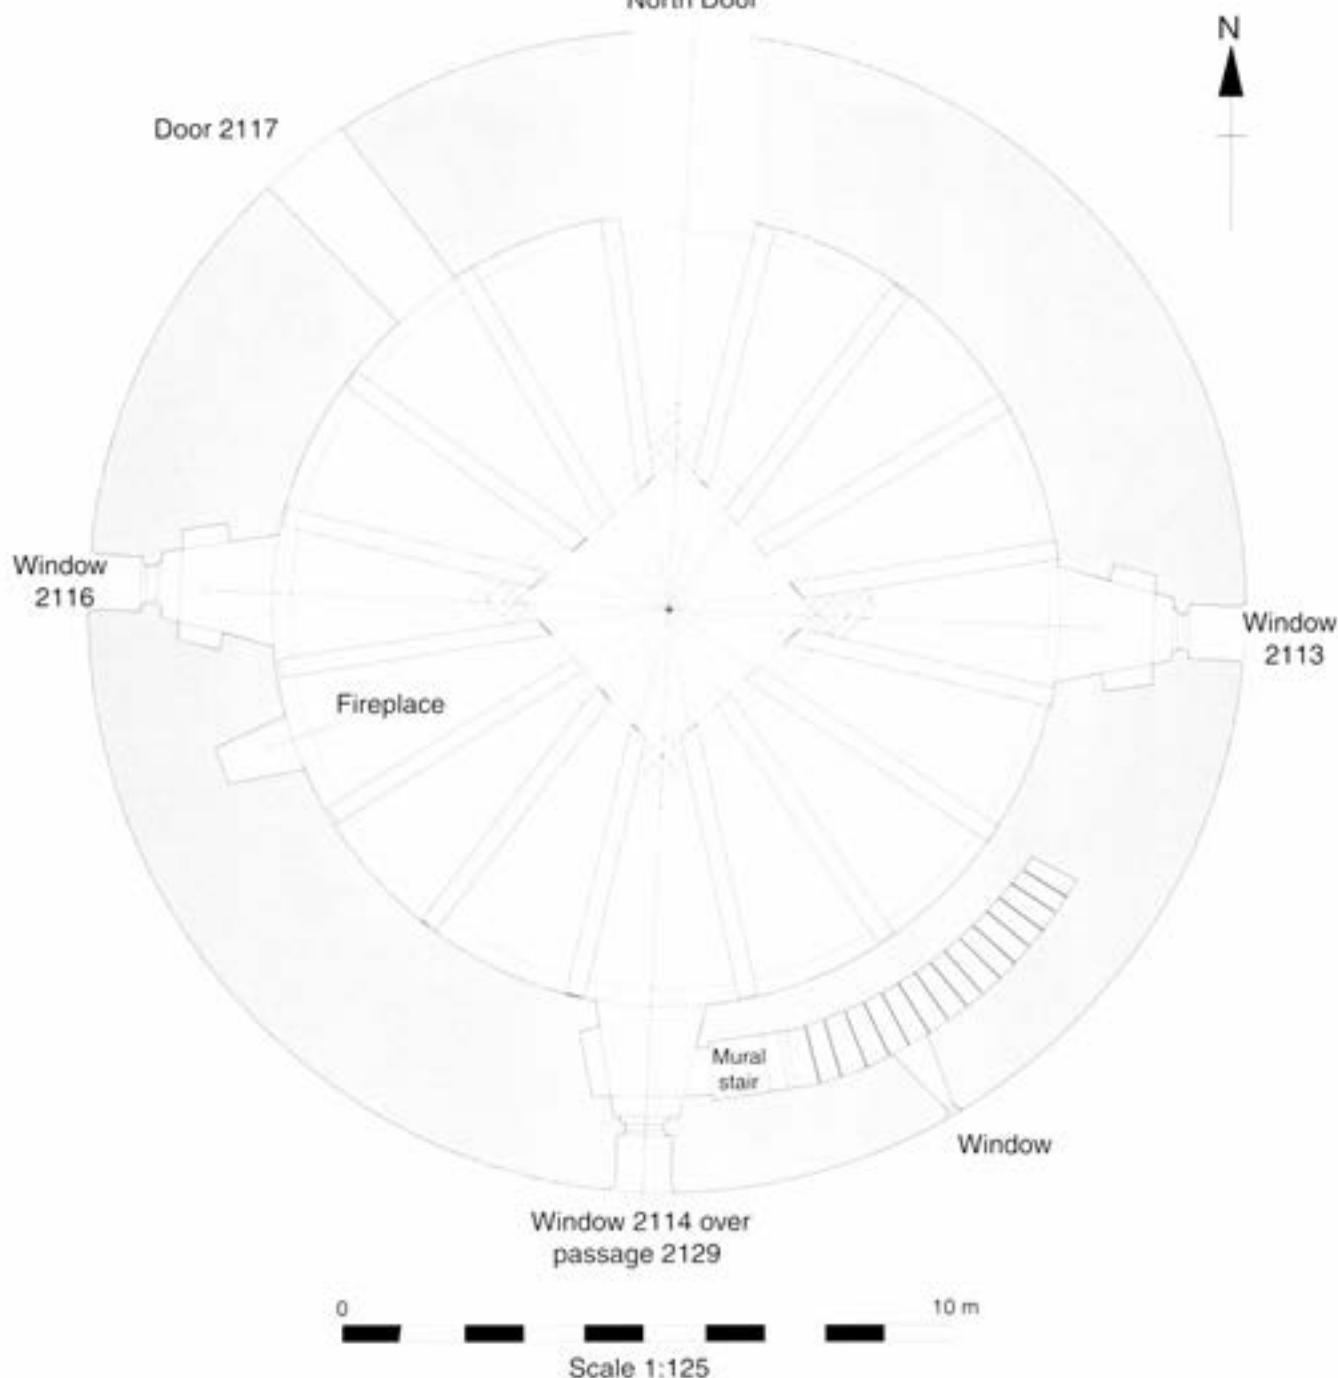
The Keep: ground floor plan with reconstruction of timber floor
